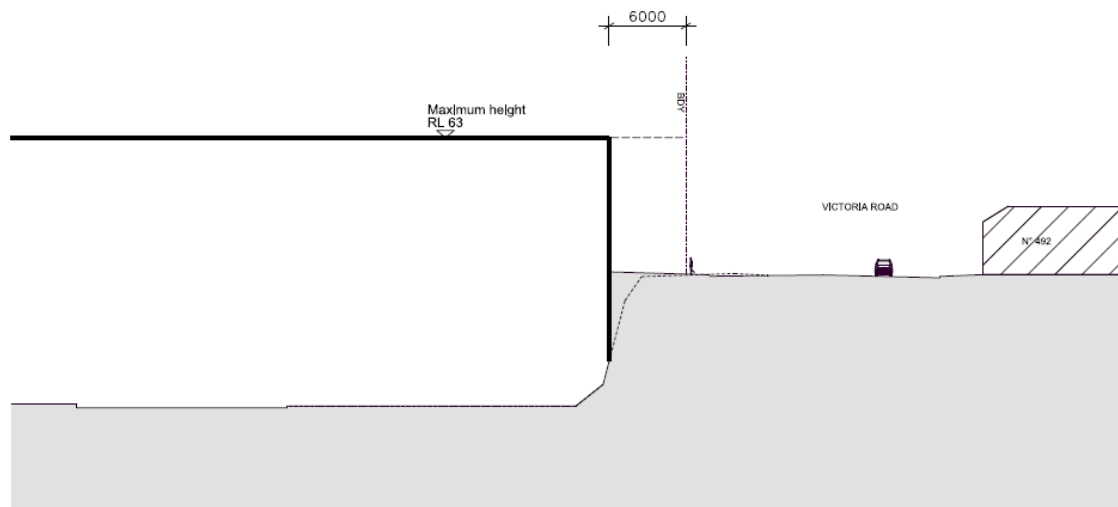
Section E Victoria Road street frontage setbacks.
